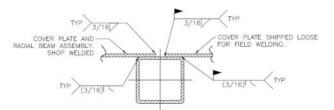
Typical Weld Detail for Radial Beam Connections
